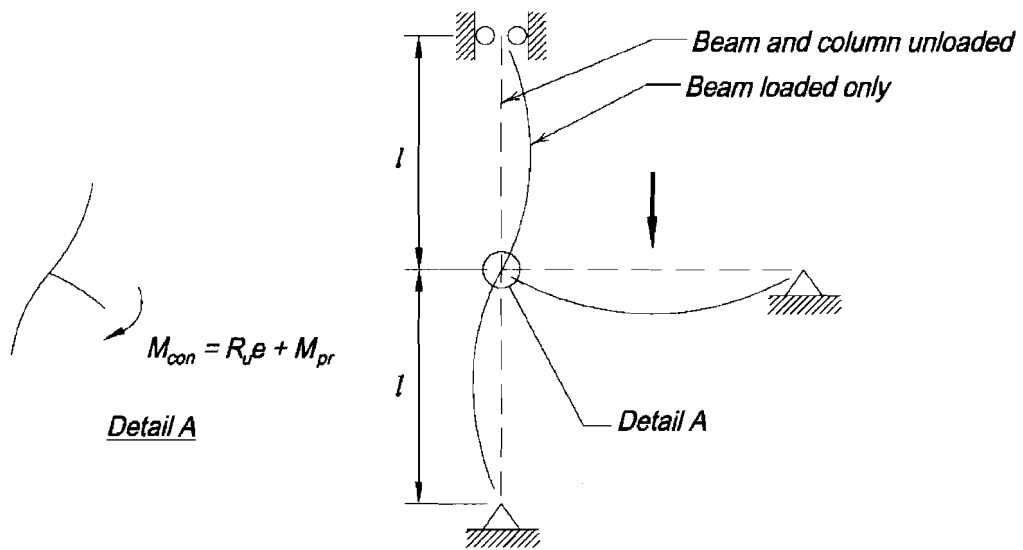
Illustration of beam, column, and connection behavior under loading of beam only.
